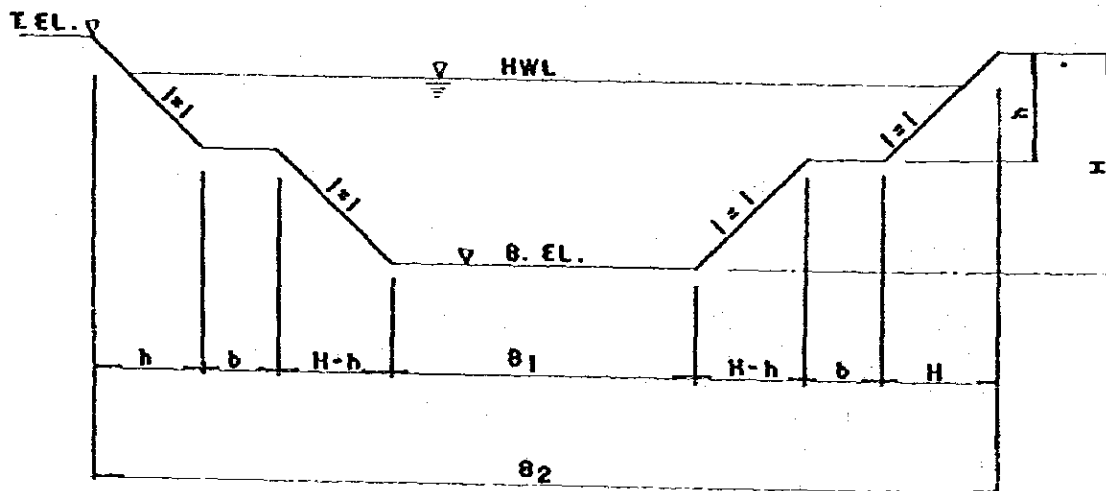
CROSS-SECTION TYPES OF RIVERS
